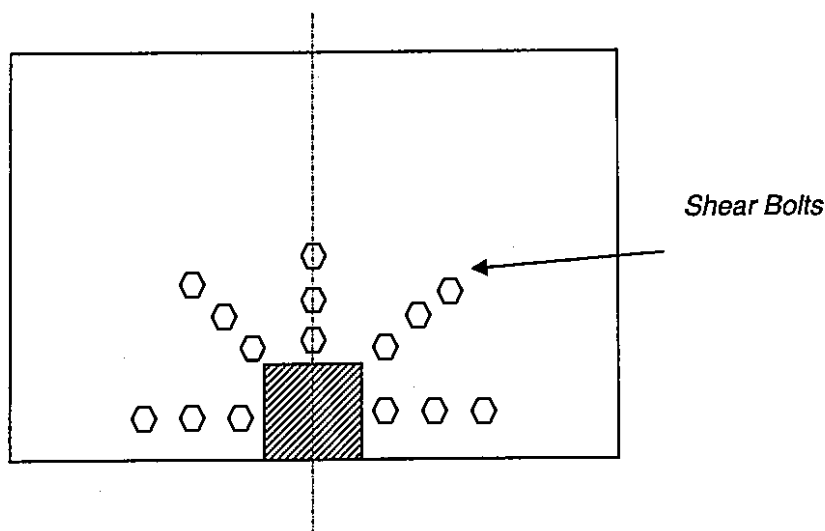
Typical Arrangement of Shear Bolts in El-Salakawy's Tests
